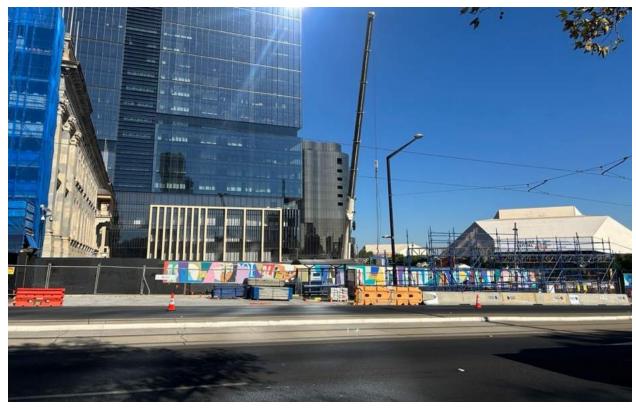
Proposed development site viewed from King William Road. Parliament House (left), Adelaide Festival Centre (right) and Festival Tower (centre) visible.
